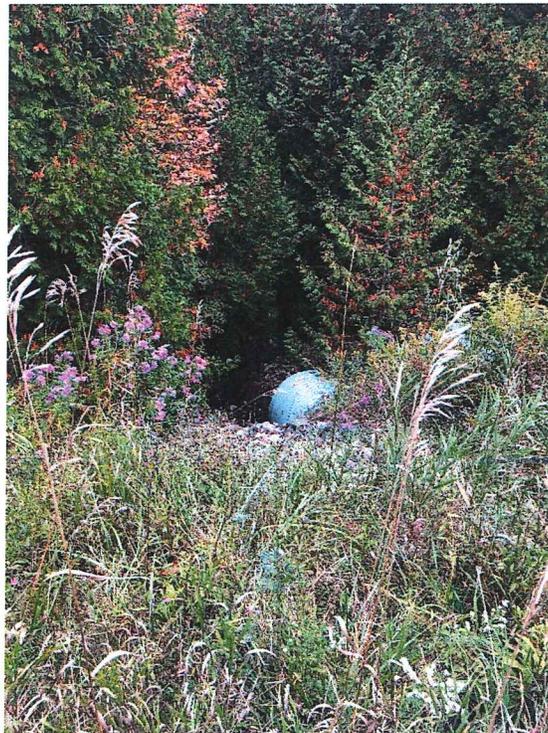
Site photo facing west near the bank of Section D-D. Photograph taken September 29, 2020.
